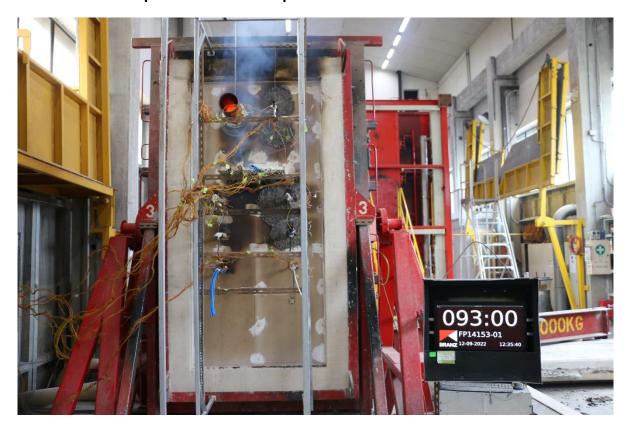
The Exposed Face of the Specimen Immediately After Testing
